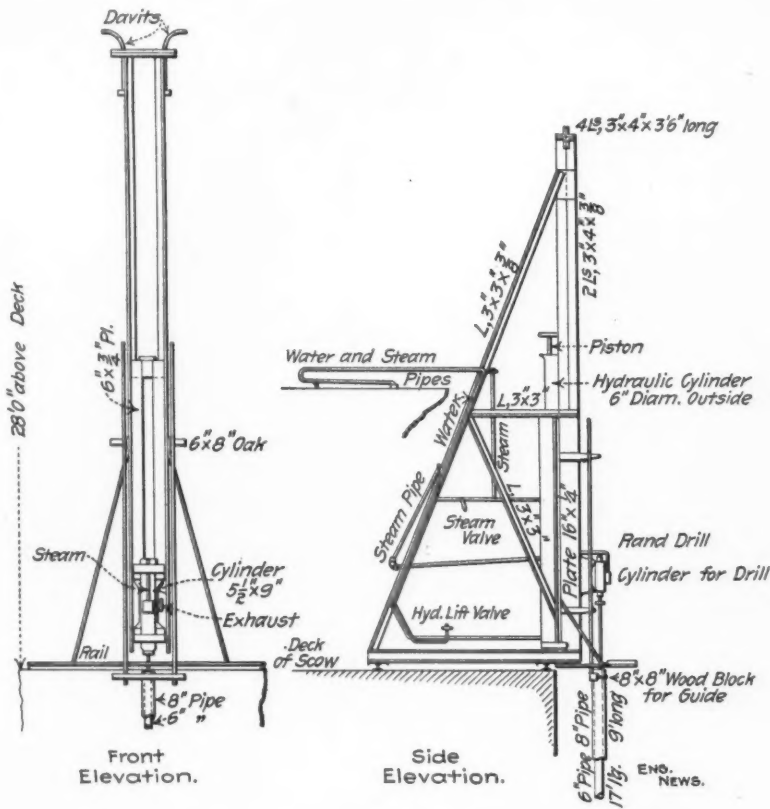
FRONT AND SIDE ELEVATION OF DRILL AND FRAME.
